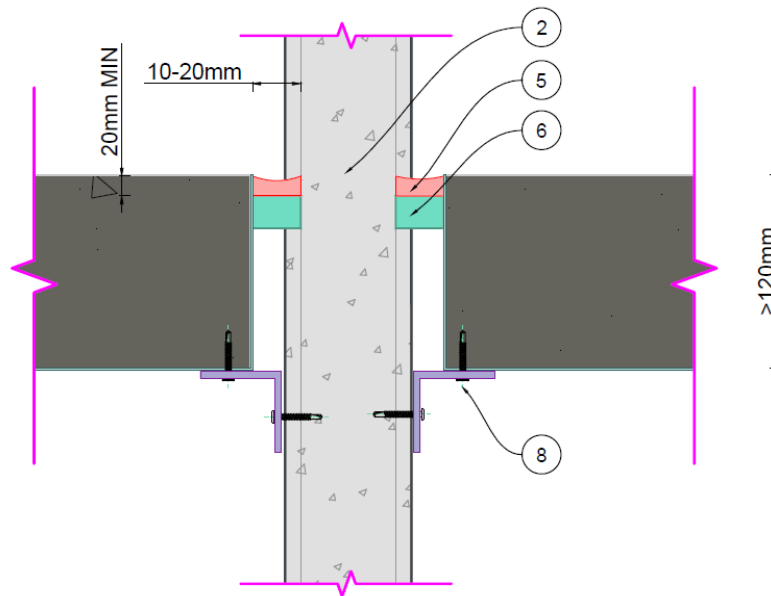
Wall-to-stair Joint (10-20 mm gap)
